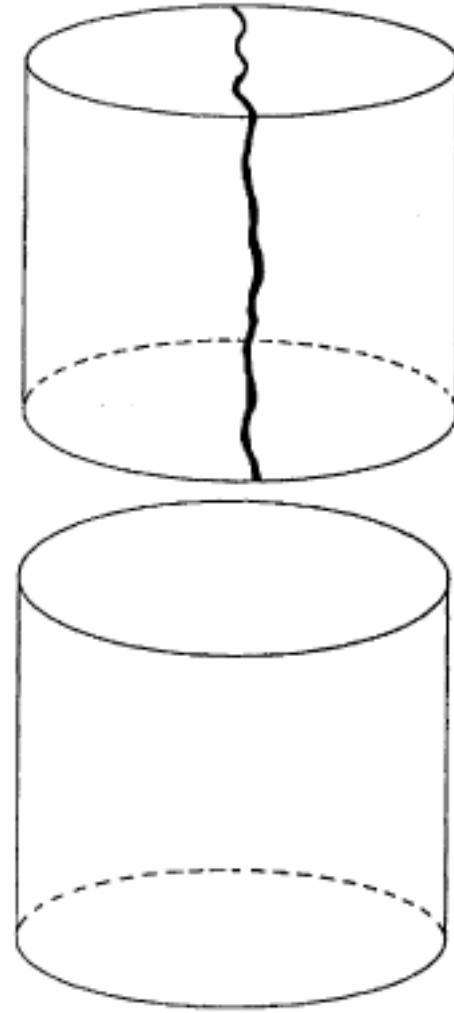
Line Drawings from Photographs of Core 2 from Cracked Section 500RF
